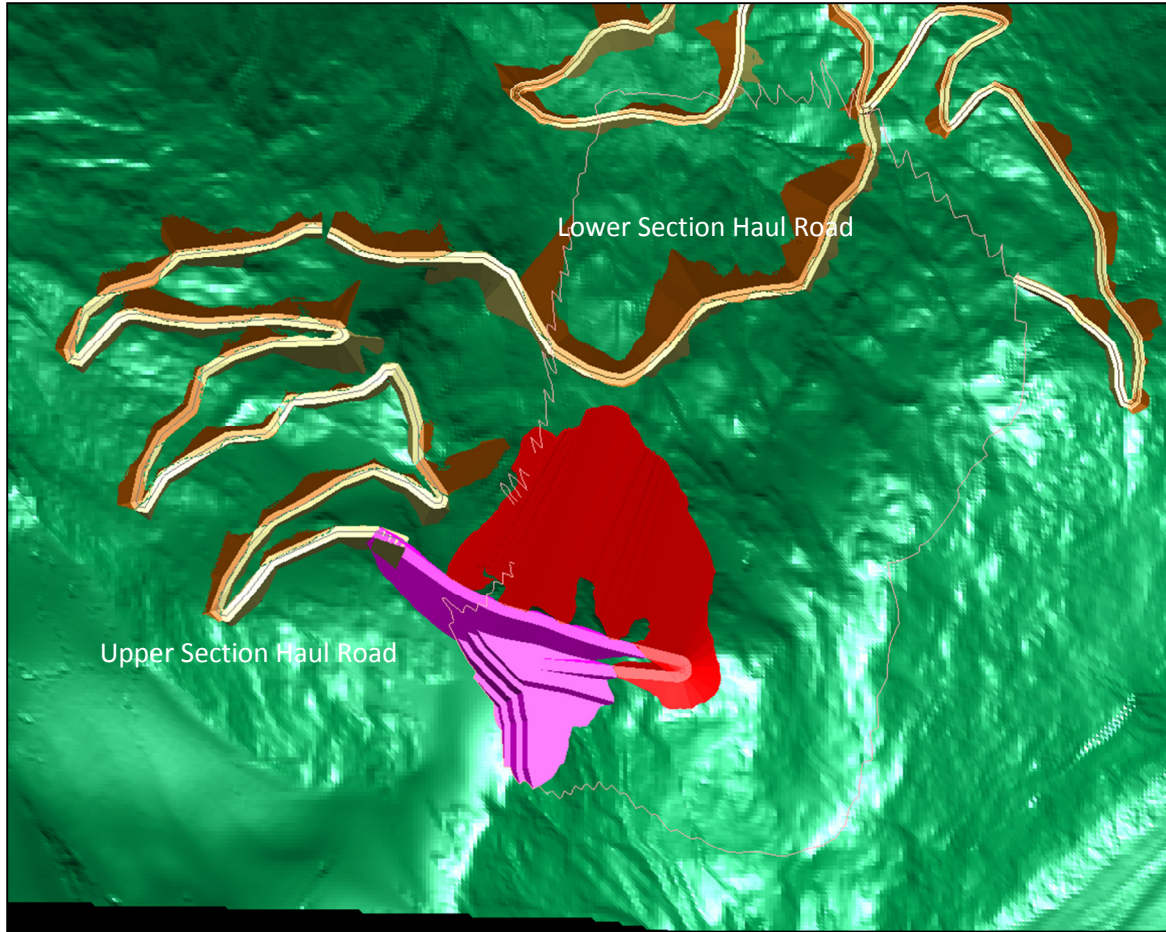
Established large load/haul equipment to the top benches of the Kerr Pit
